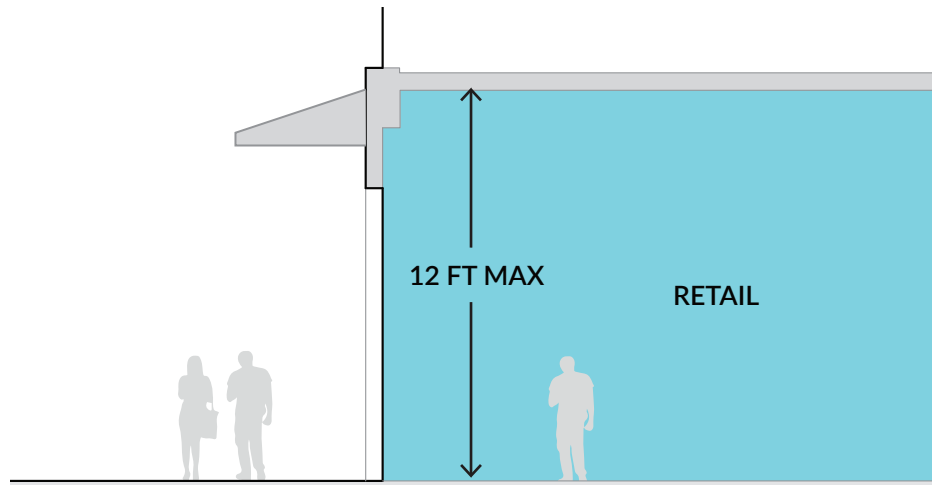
Clear ceiling height in ground-floor commercial spaces.
